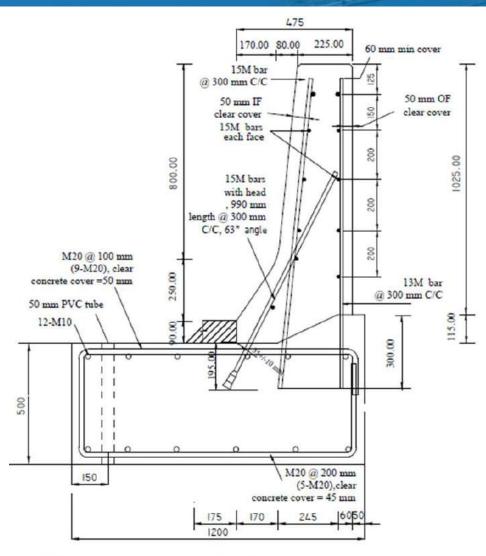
Barrier specimen B-1 details (Interior Location - No Cantilever)
